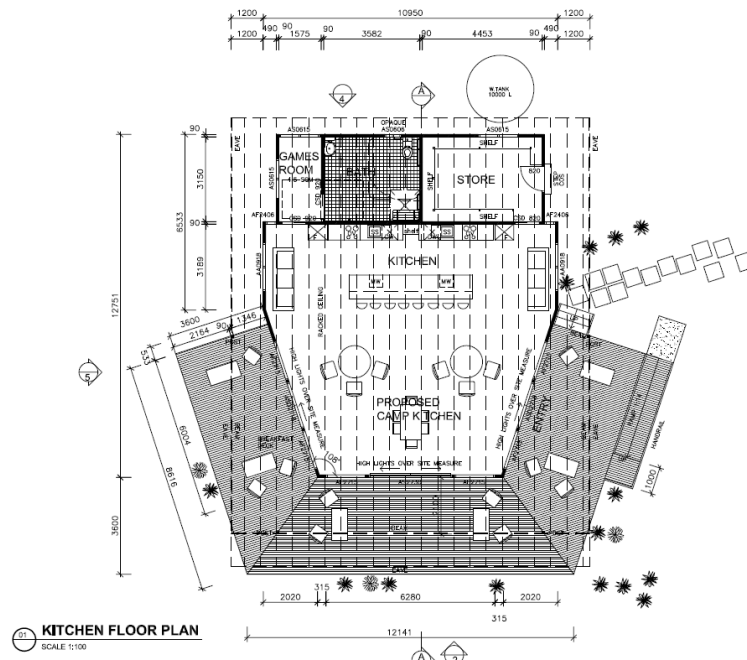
Extract of proposed floor plan of communal camp kitchen building
